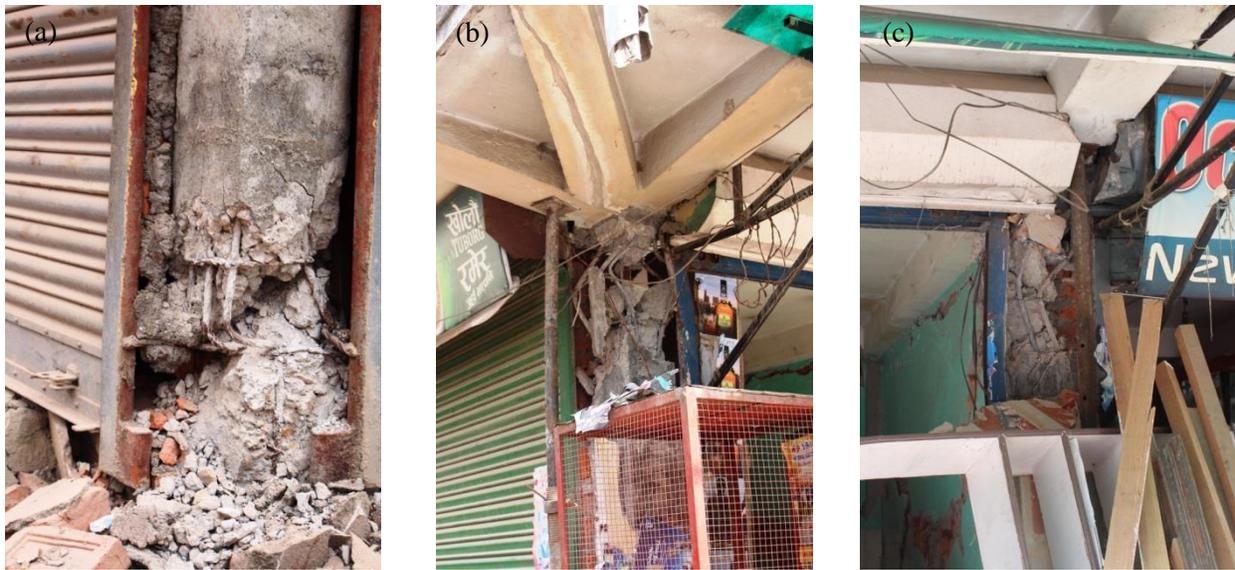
Failure due to the insufficient confinement and low quality concrete at columns.
